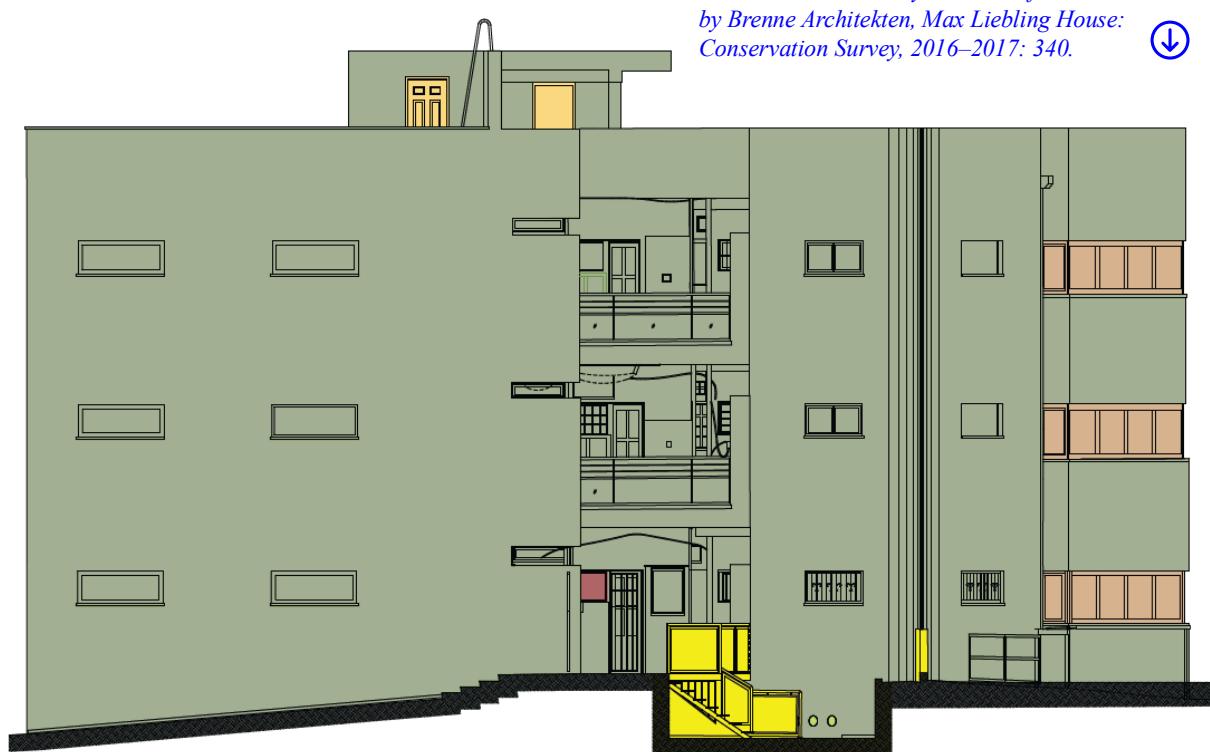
Preservation measures for doors and windows done on the east façade. Source: Illustration by author, information by Brenne Architekten, Max Liebling House: Conservation Survey, 2016–2017: 340.
